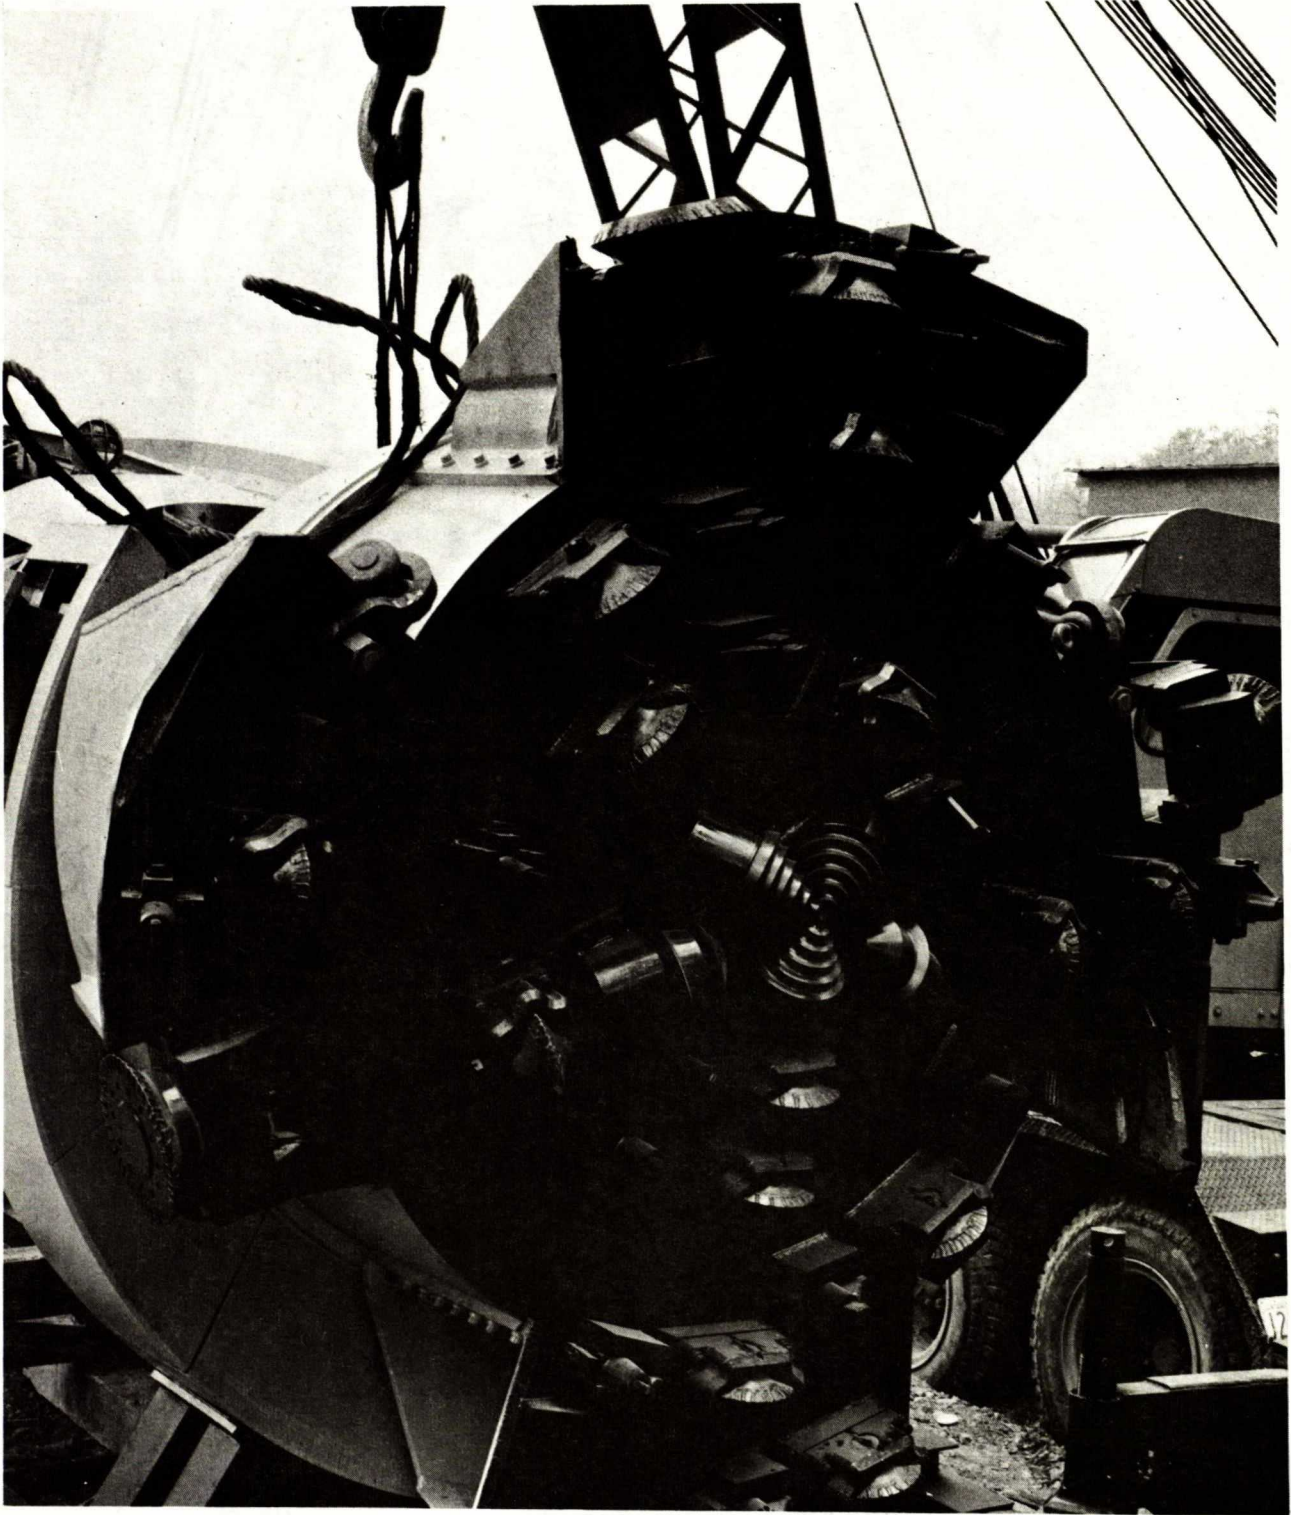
Front view of cutterhead assembly when boring started on May 8, 1958.
